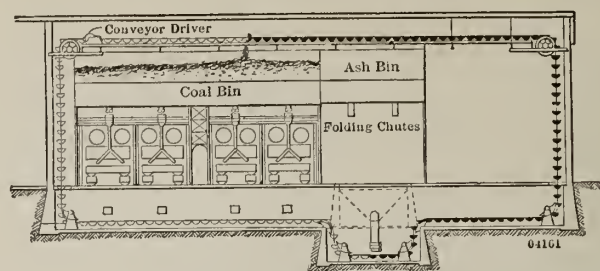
SECTION THROUGH A POWER PLANT EQUIPPED WITH HUNT CONVEYOR
